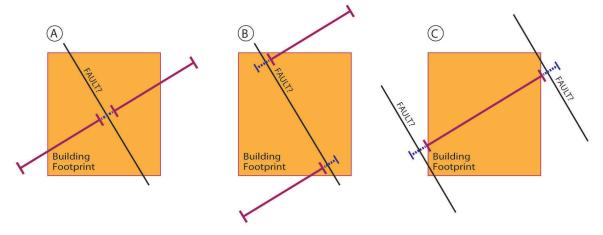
Potential problems caused by improper trench locations: (A) gap between trenches, (B) trenches without adequate overlap, and (C) trench does not fully cover building footprint given fault trend. Dashed lines indicate additional trench length needed (from Christenson and others, 2003).
